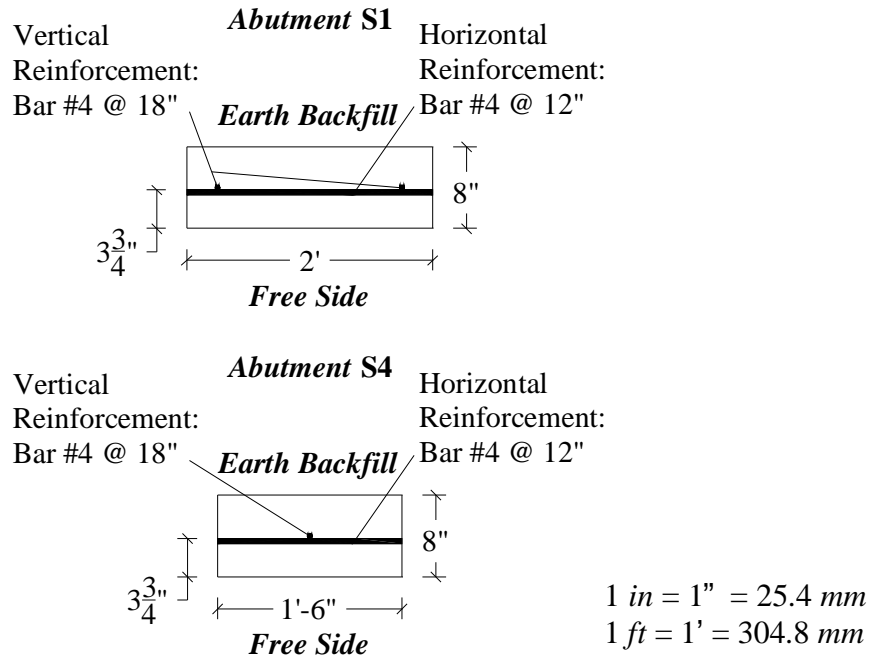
Abutments S1 and S4 Un-strengthened Section
